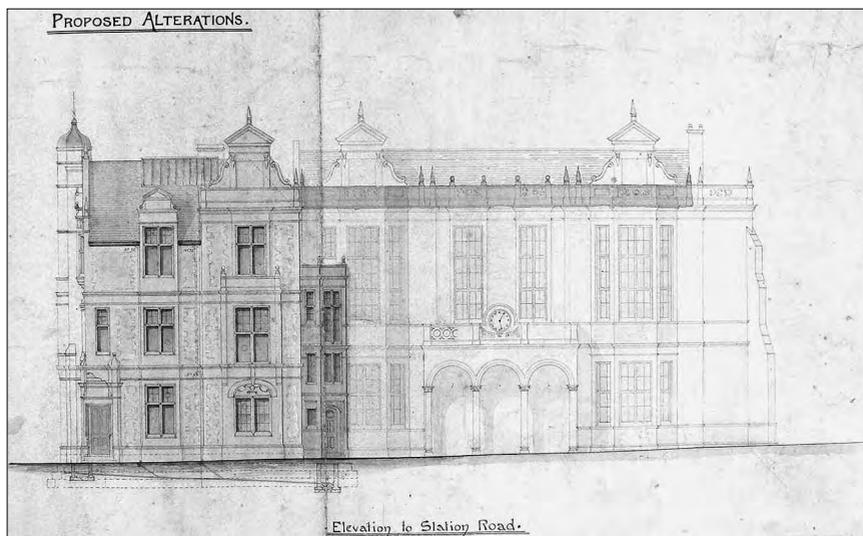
Plan of proposed alterations to Redhill Market Hall, 1891, Charles Taylor and Ernest Black, architects (SHC ref 8328/6/8).
